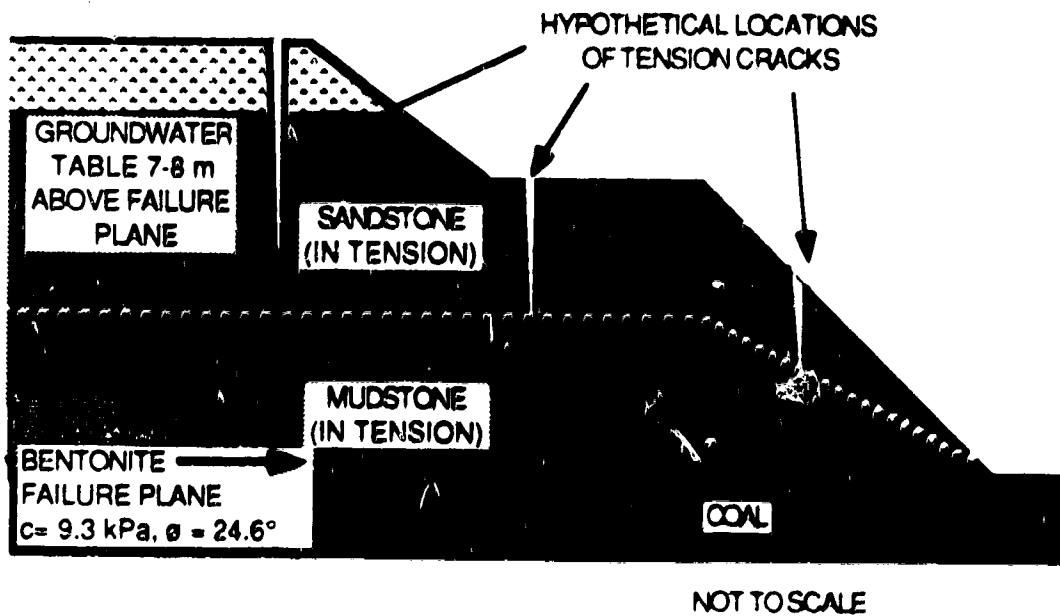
Planar Shear Model used by Barron and Stimpson (adapted 1986) to analyse failure of highwall in Pit 03 in spring, 1984.
